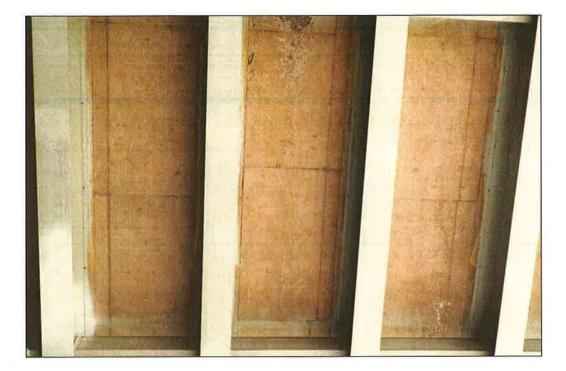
Typical Condition of Soffit (Bent 301-302) (fair-to-poor condition – stained and unstained cracking, delaminations, spalls, patches, wet areas and light scaling)
